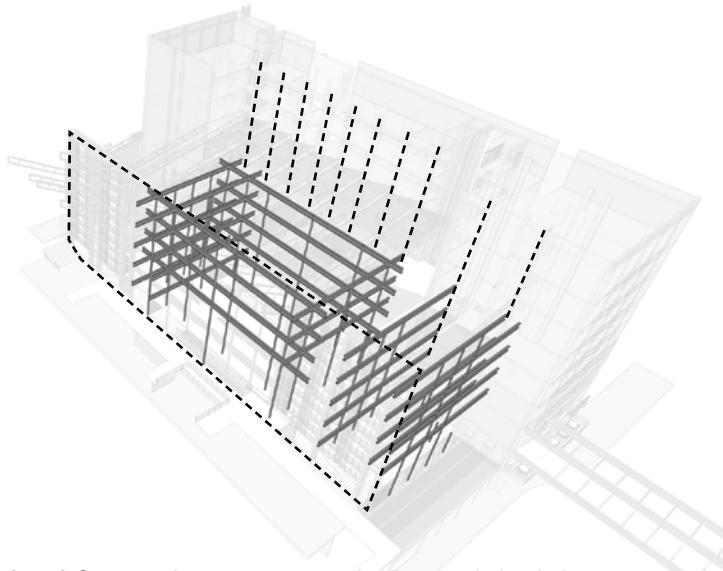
Structural support system for floor and circulation systems. Horizontal beams structural members fasten the primary threshold structure to the Govpret structure (dashed lines) to provide lateral stability.
